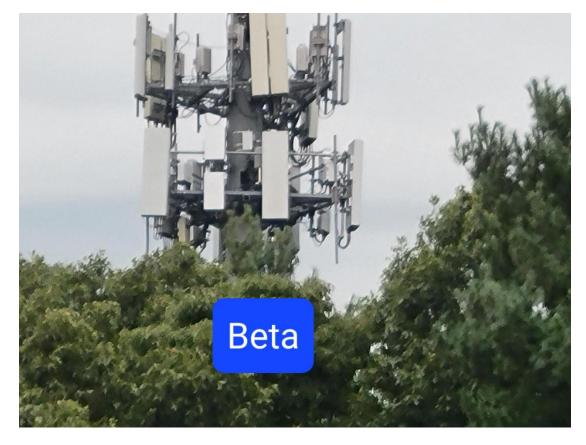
Installation of Antennas and Equipment on Beta Sector (From Ground)
